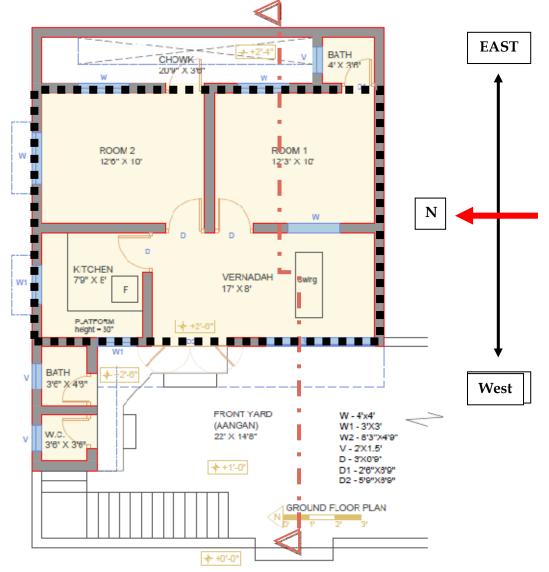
Plan of the base case house in Chitrawad (Source: Author)
